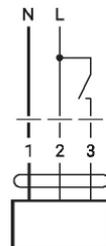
Cable adapters for condenser shut off valve actuator and limit switches
